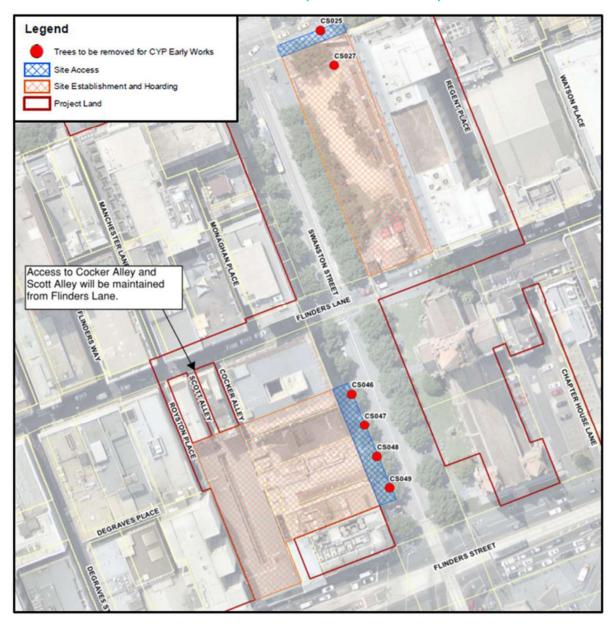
Excerpt from the Site Layout Plan which identifies CYP Early Works within the CBD South Precinct
